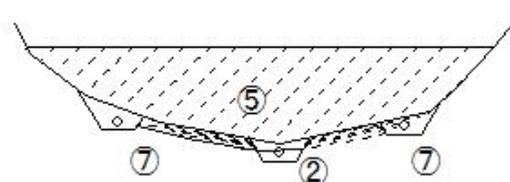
Example of layout of underground drainage facilities (cross-sectional view)
